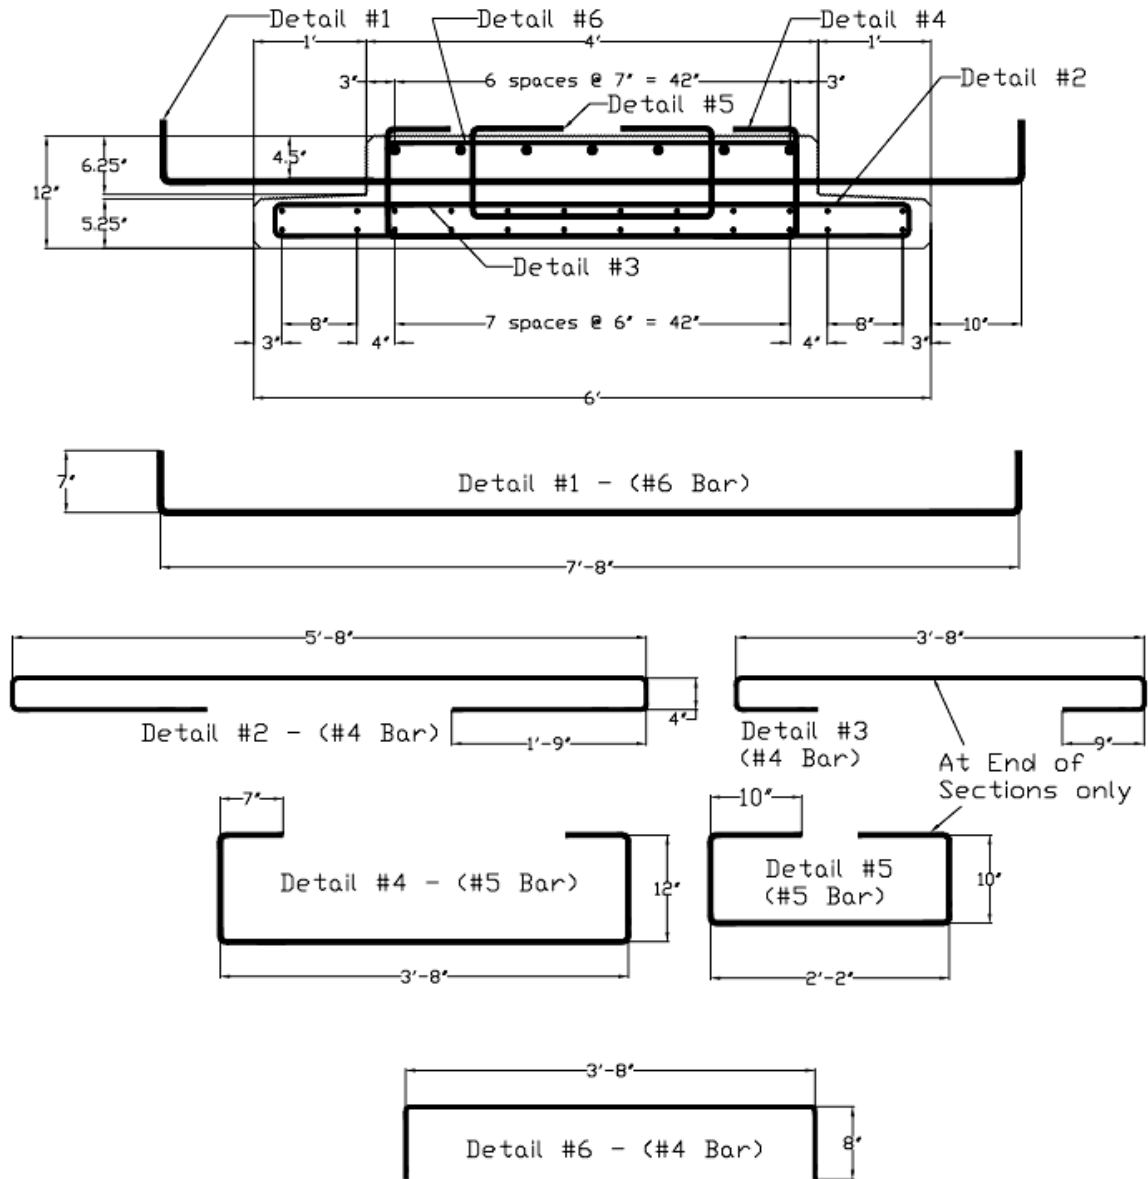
Cross-sectional view and reinforcement details for an interior inverted-T precast section used in Mn/DOT Bridge No. 13004 (the dimensions of the reinforcement are taken from the outside of the bar)
